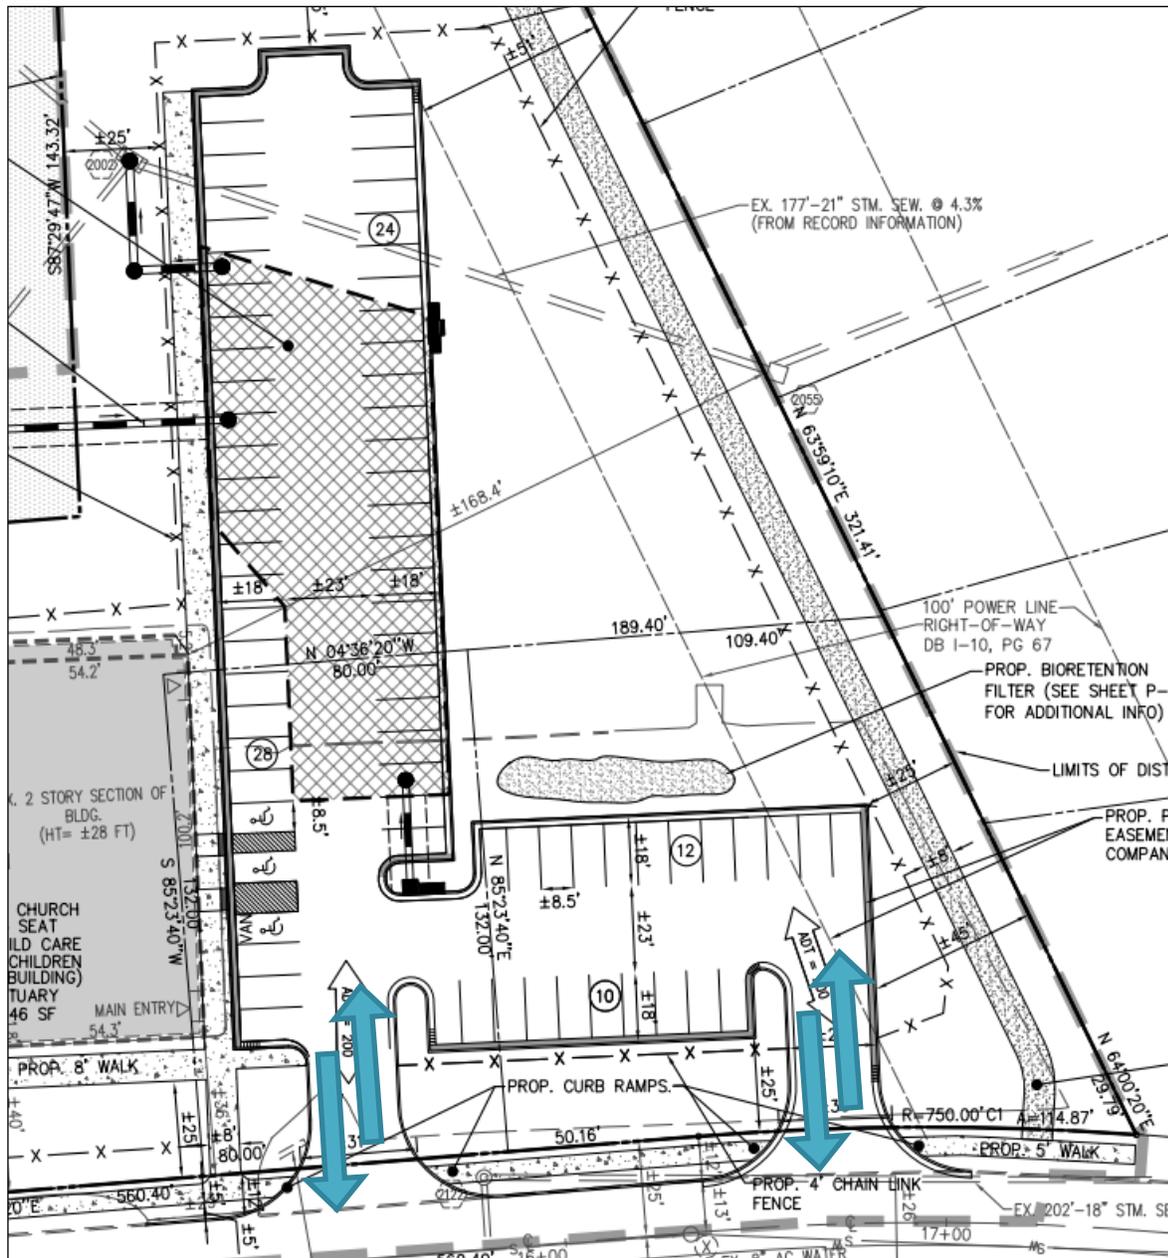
The arrows show where cars would access the reconfigured parking lot (Source: Walter Phillips, Inc. – November 19, 2013)
